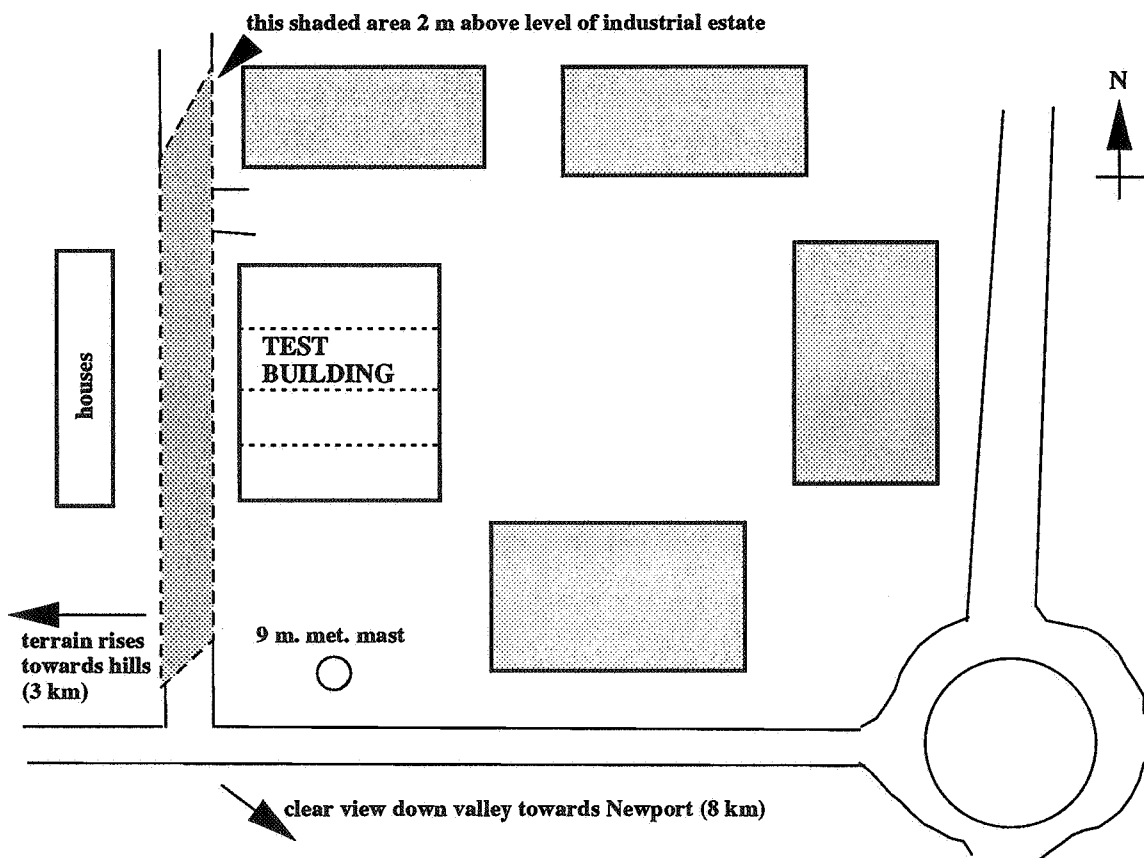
SITE PLAN OF TEST INDUSTRIAL BUILDING
